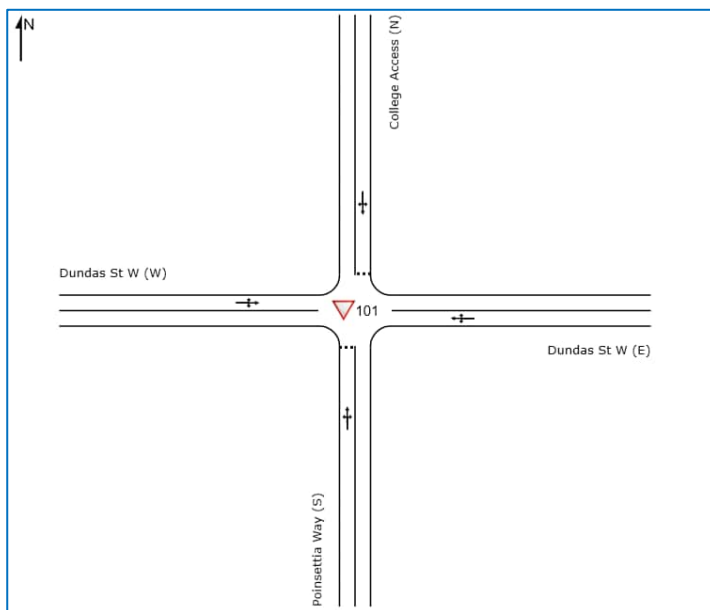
SIDRA Generated Layouts of the Dundas Street W/ Poinsettia Way T- Intersection (Existing and Proposed)
